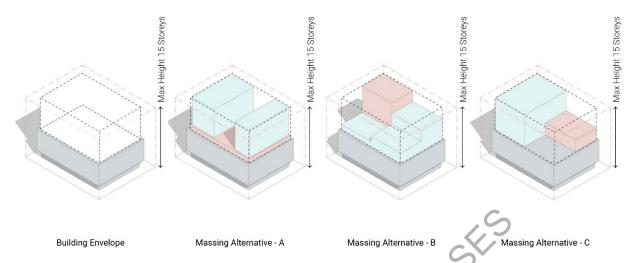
a. Mid-range high-rise building (9-15 storeys): building envelope and possible massing alternatives.
